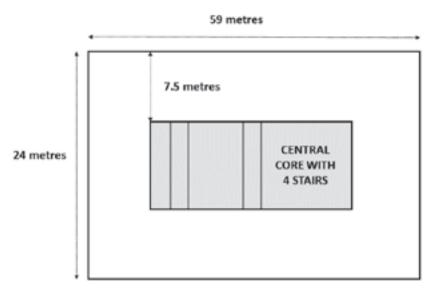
Plan of the 12th floor at the First Interstate Bank 1988
